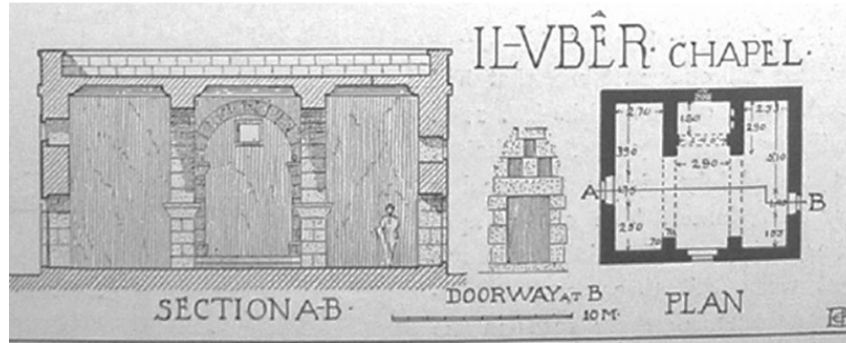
al-ʿUbirī Chapel plan and section, (Butler, 1929, p. 120)
